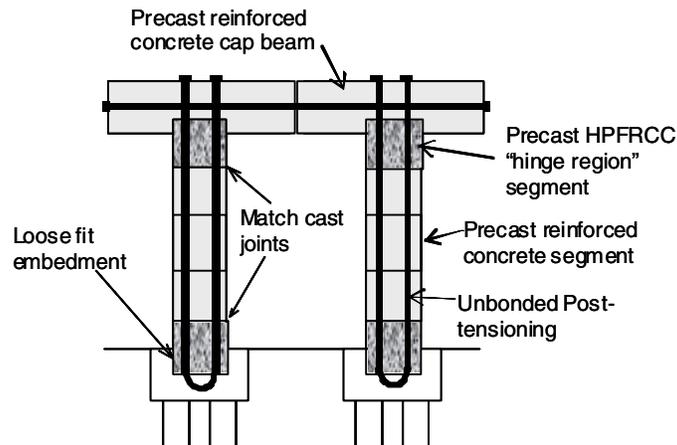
Schematic of proposed self-centering, precast concrete bridge pier system for seismic regions.
